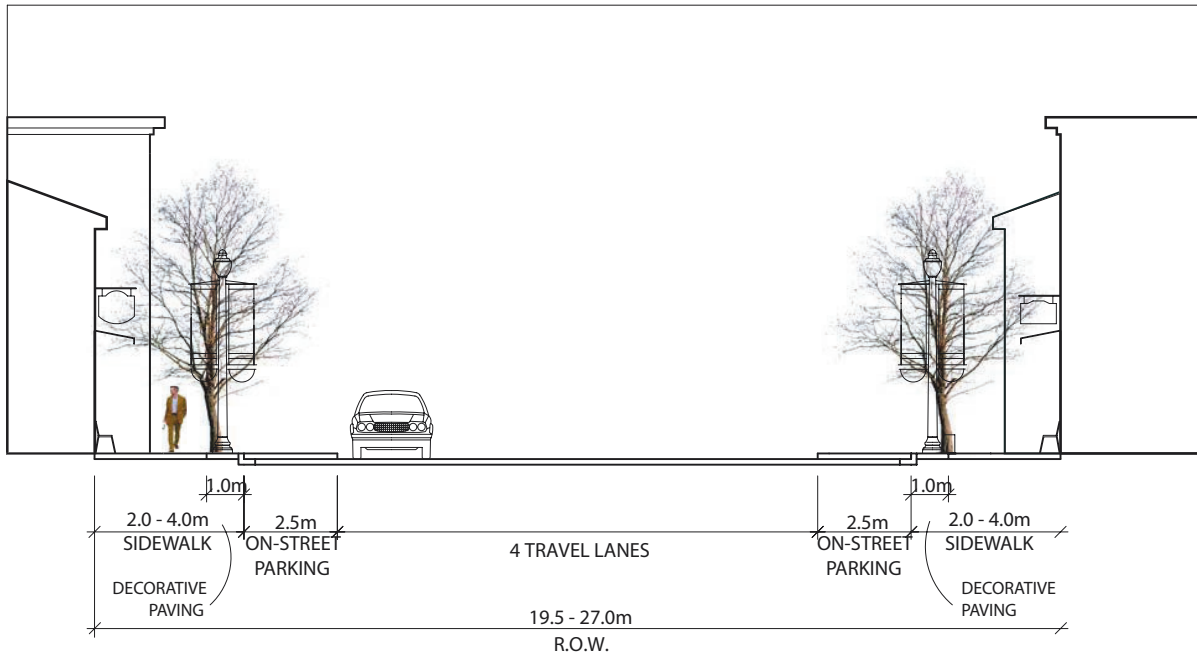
A typical street section at the Village Centre has four travel lanes, two parallel parking lanes, street trees, sidewalks, crosswalks, and sidewalk widenings at the intersections.
